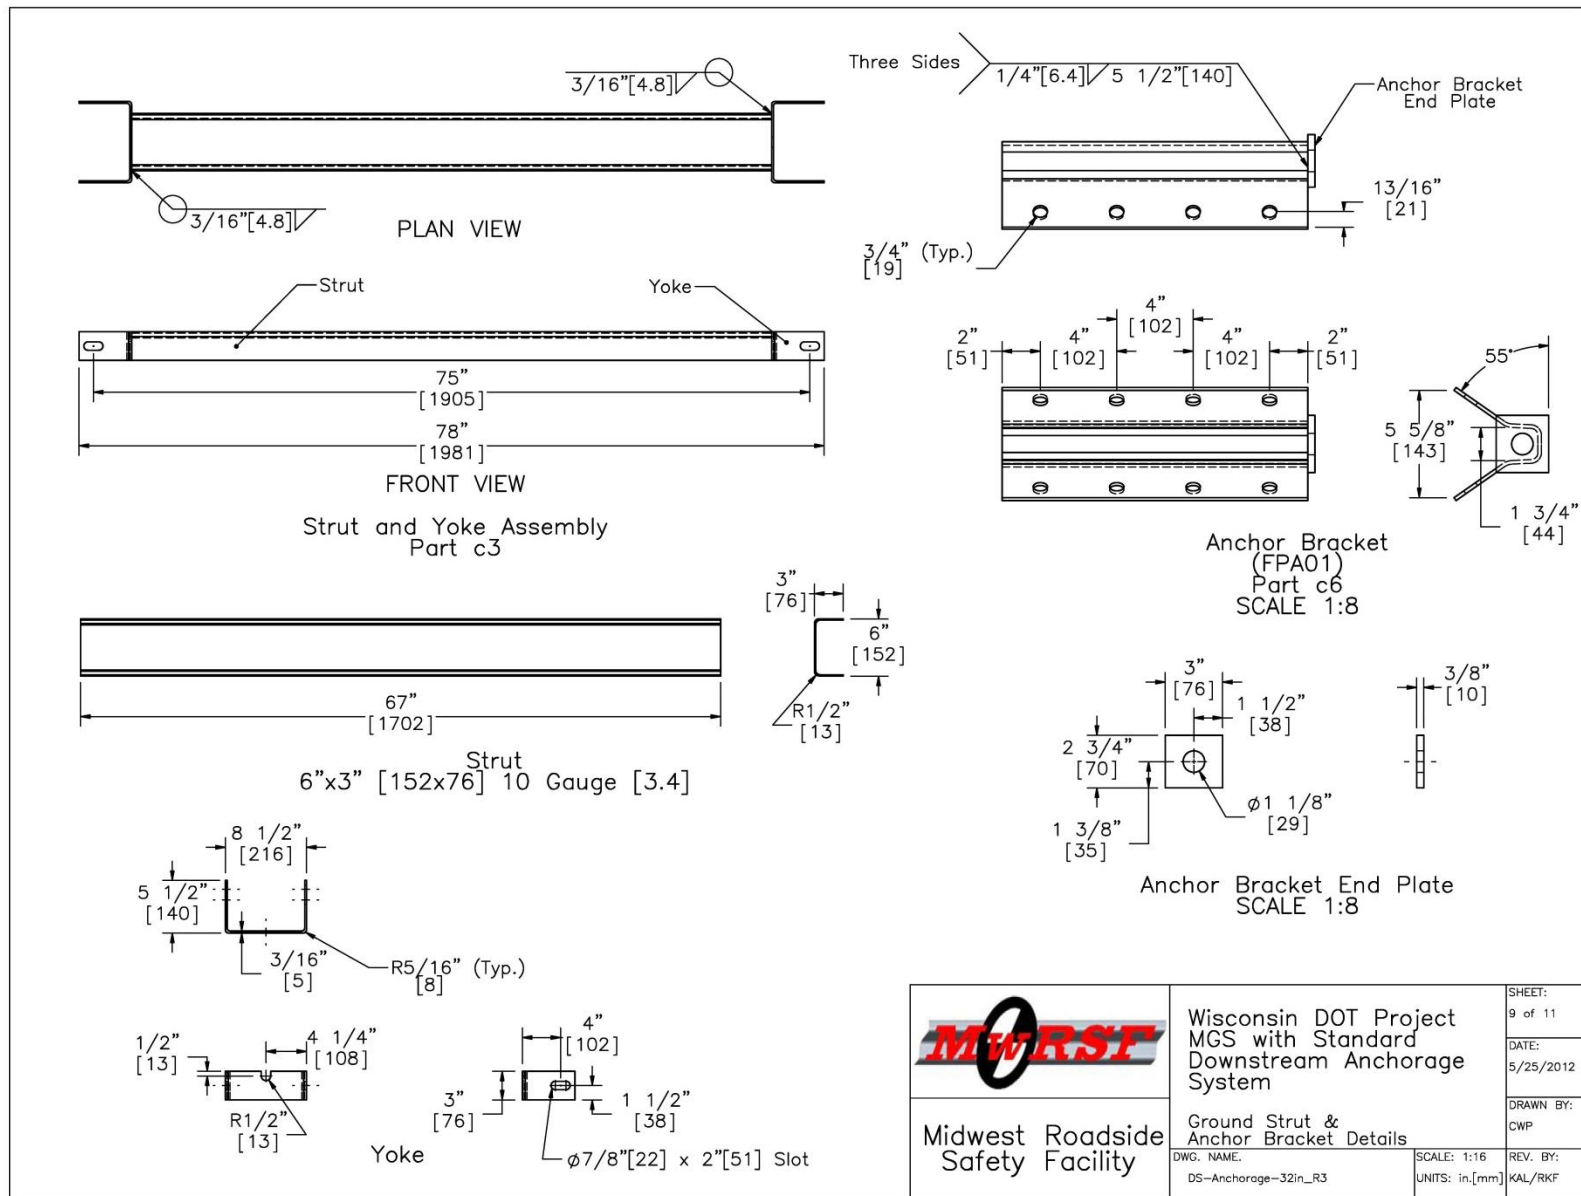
Ground Strut and Anchor Bracket Details, Test No. WIDA-2
